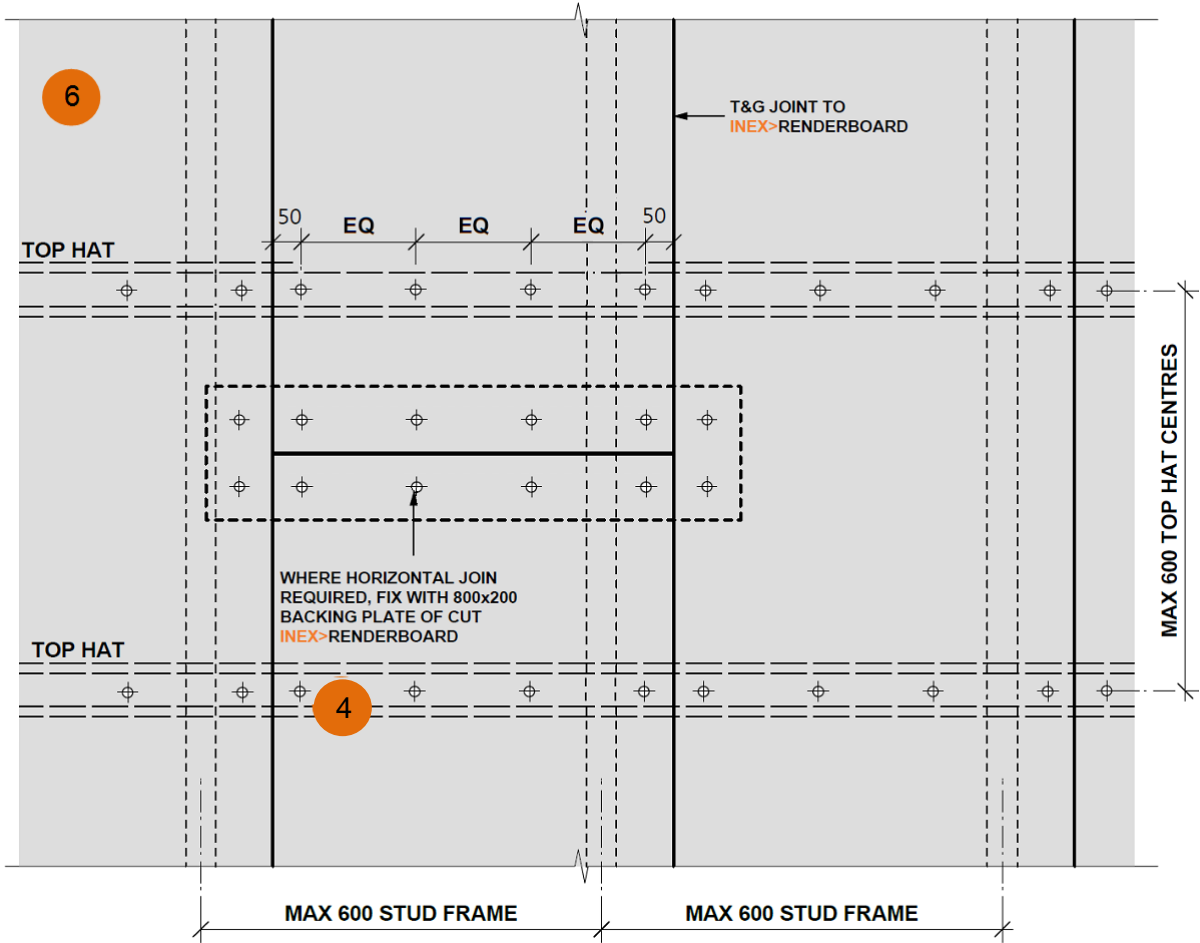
Vertical INEX>RENDERBOARD Wall System Steel or Timber frame – Sheet fixing details
